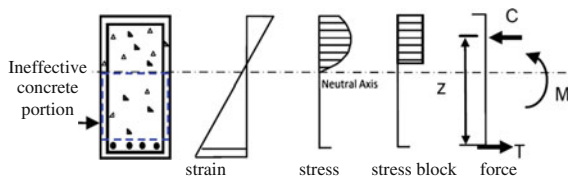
Strain, stress and force diagram of a reinforced concrete section
